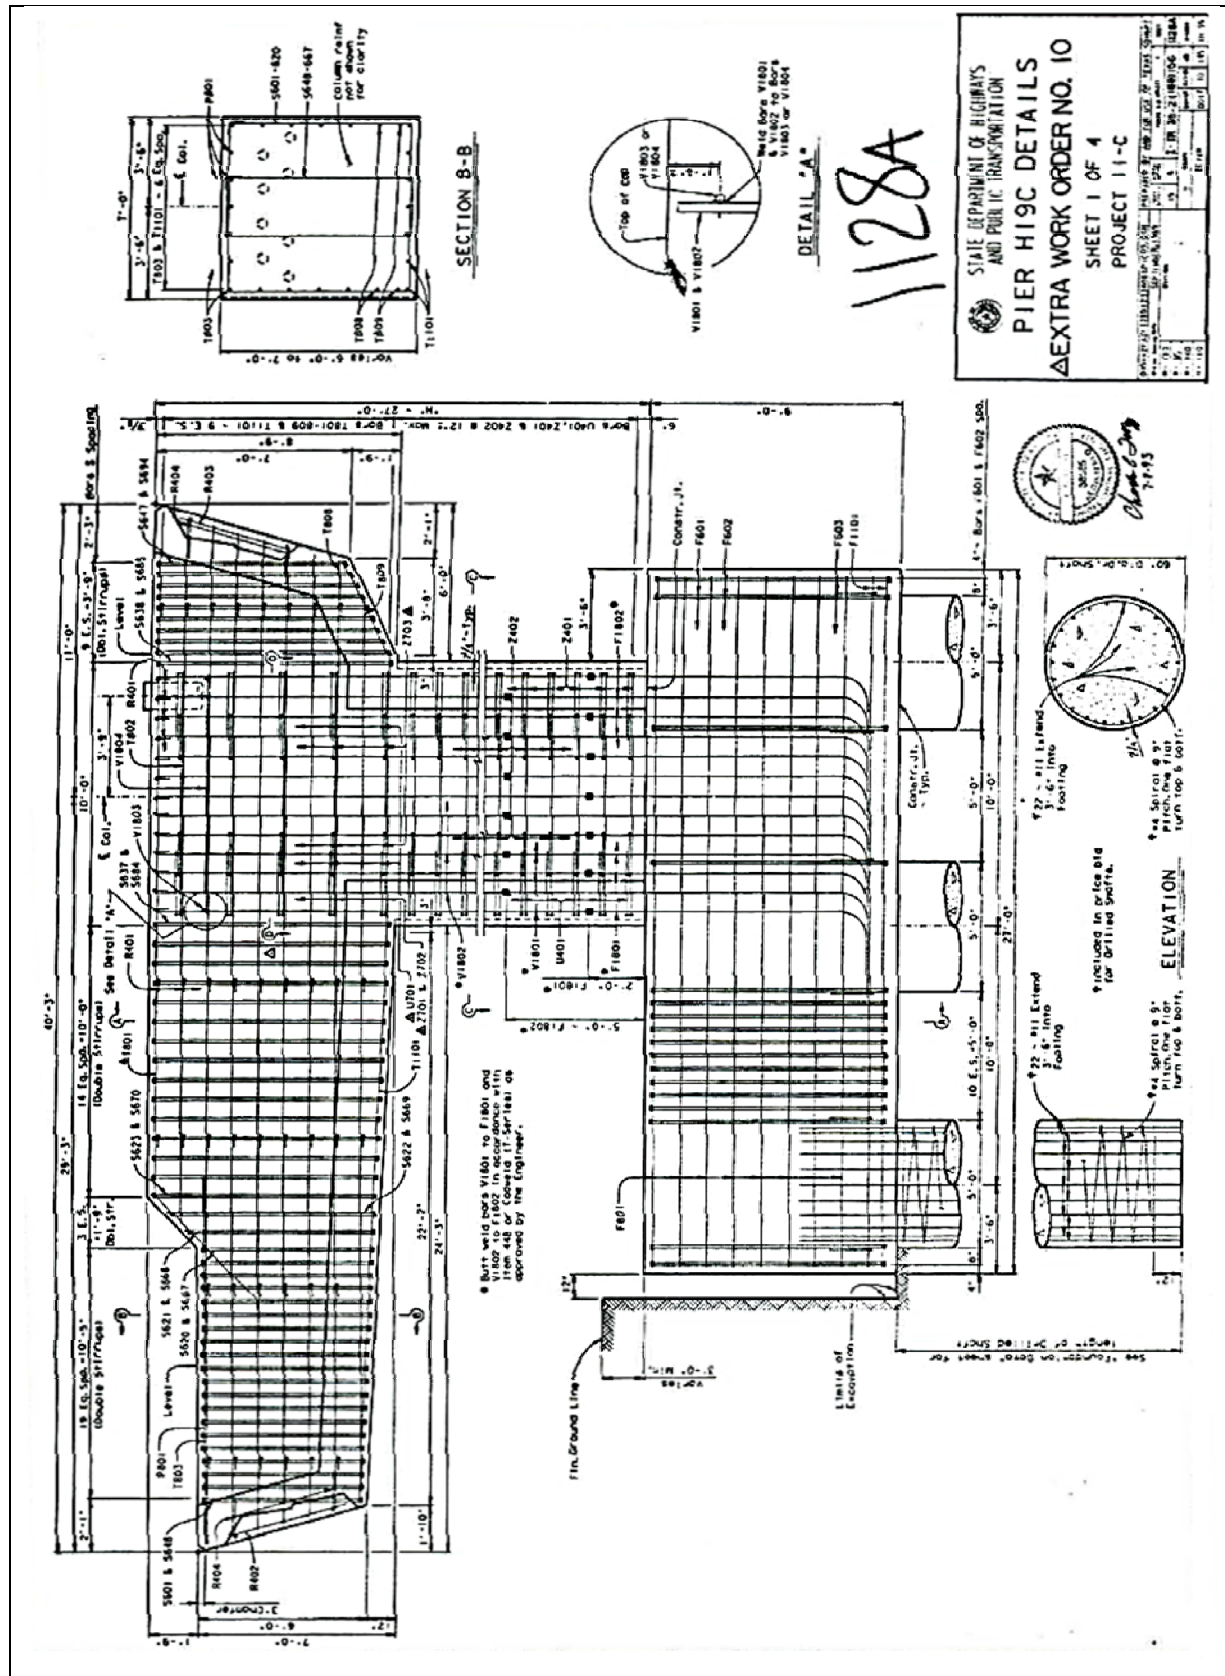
Layout and Reinforcement Detail of Pier H19C-Sheet 1.
